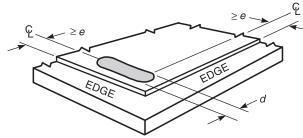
Arc Seam Welds Along Standing Rib (see 2.2.5)
